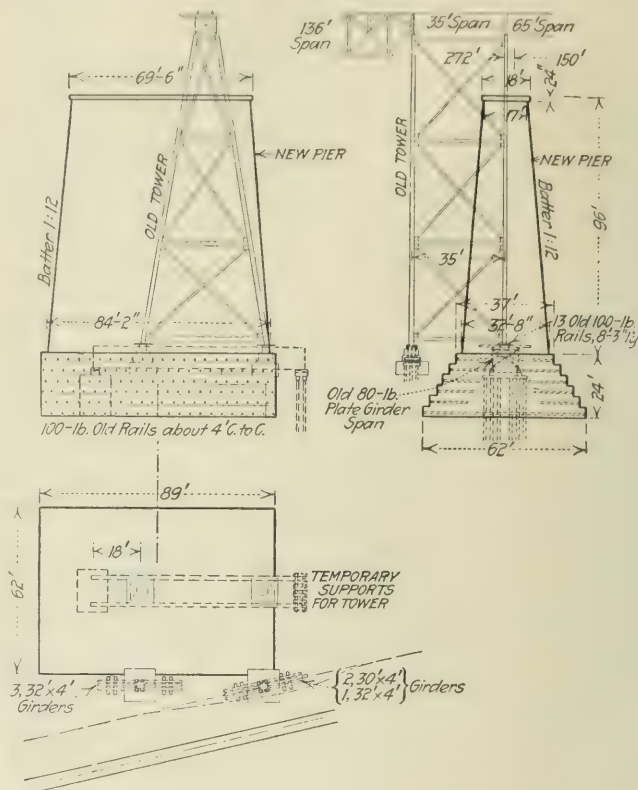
PIER B AND SUPPORT OF VIADUCT TOWER
